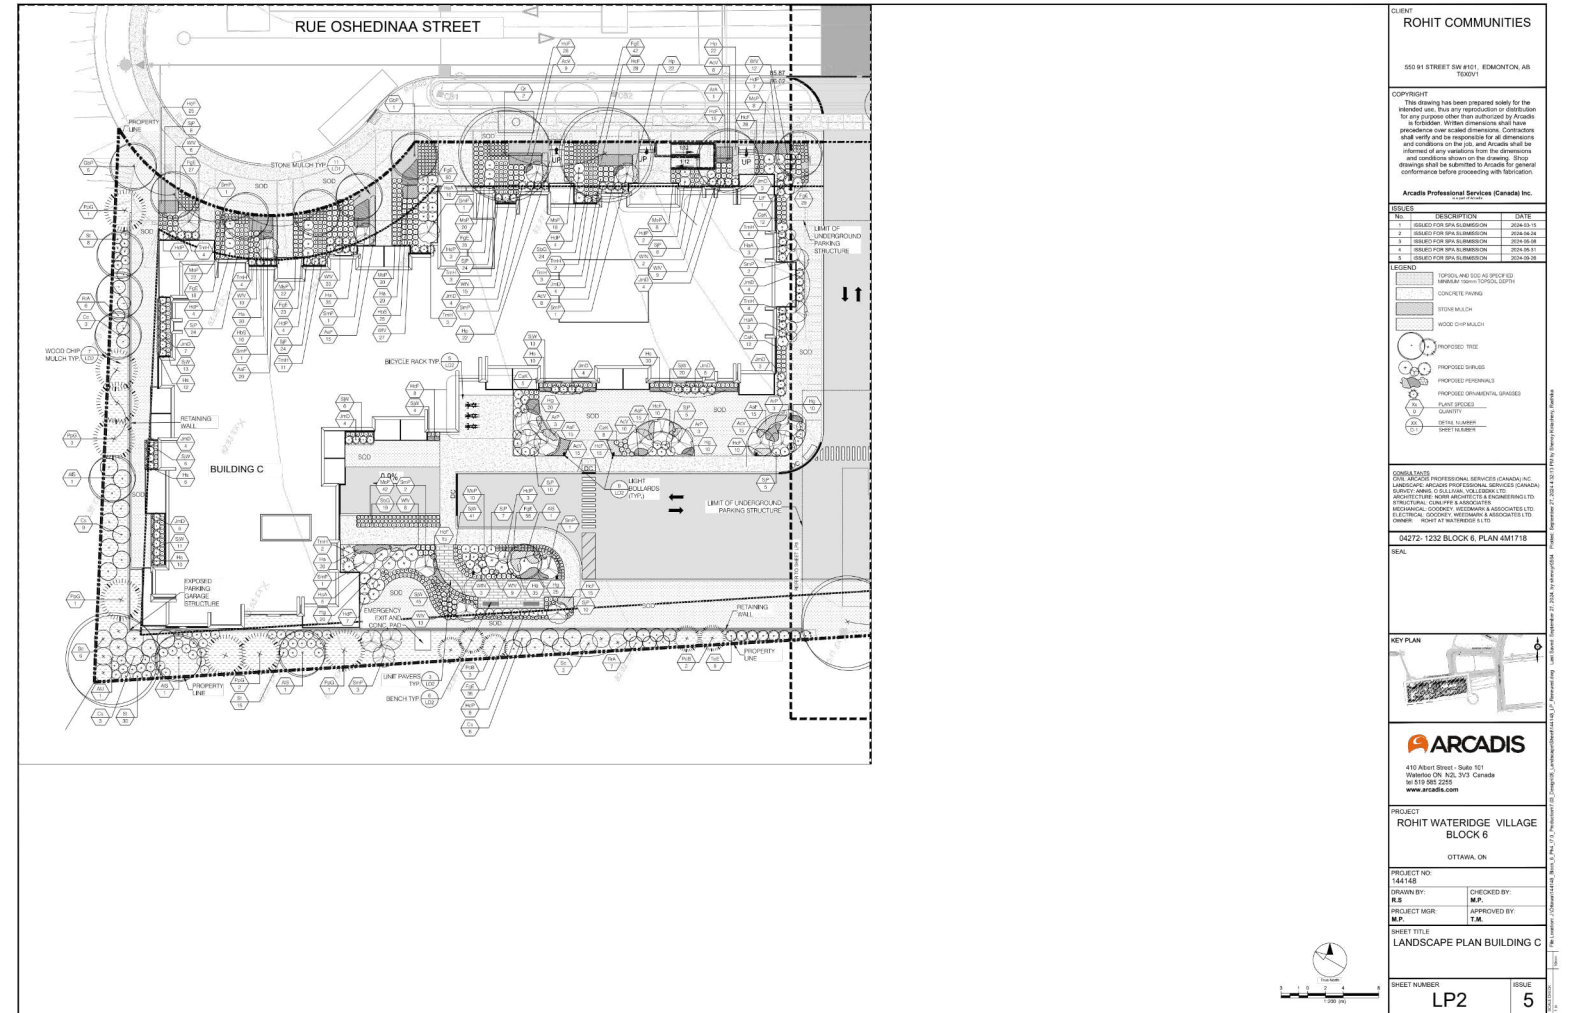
Landscape plan at Building C, courtesy of Arcadis (September 2024).
